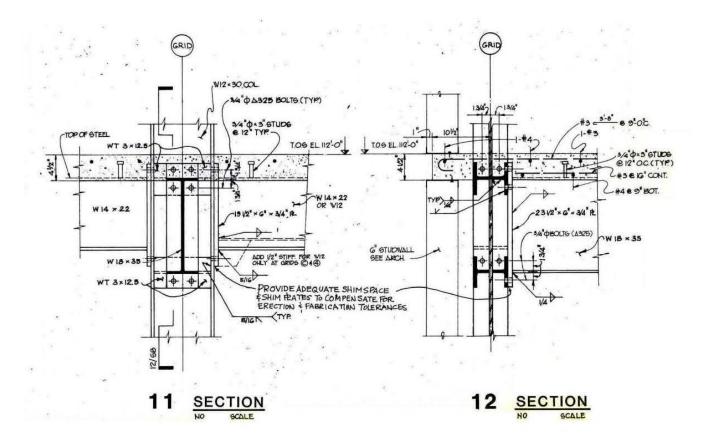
Hospital – Moment-Resisting Connections/Girder Flange Continuity Plates (Section 11/S-8 and 12/S-8)
